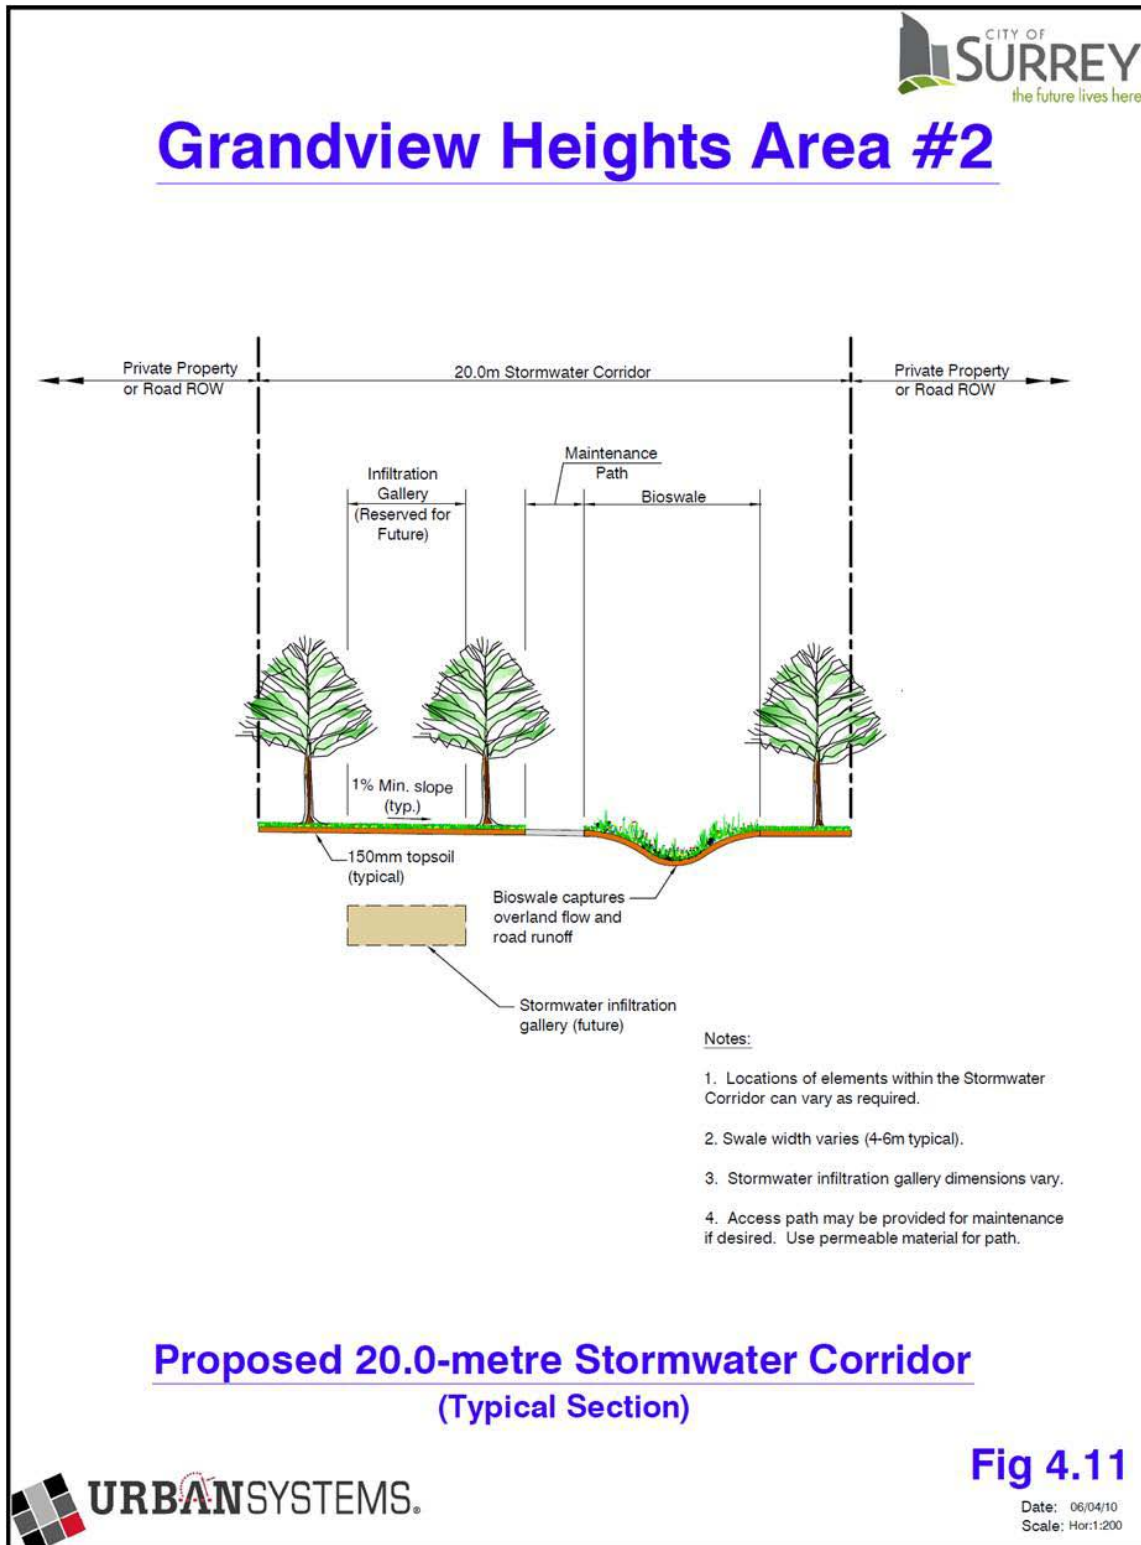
Proposed 20.0-metre Stormwater Corridor
